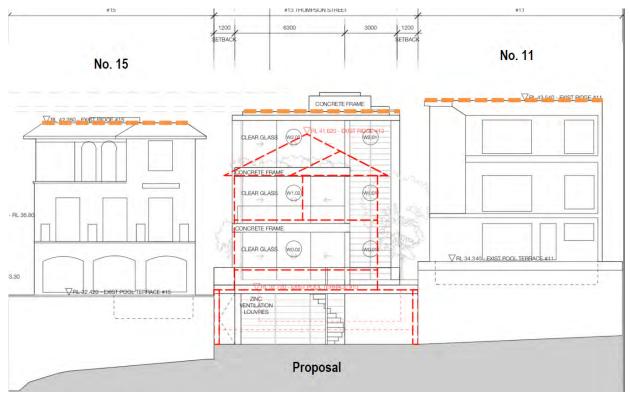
South elevation of subject site and adjoining properties showing the height of the roof (excludes popup skylight)
